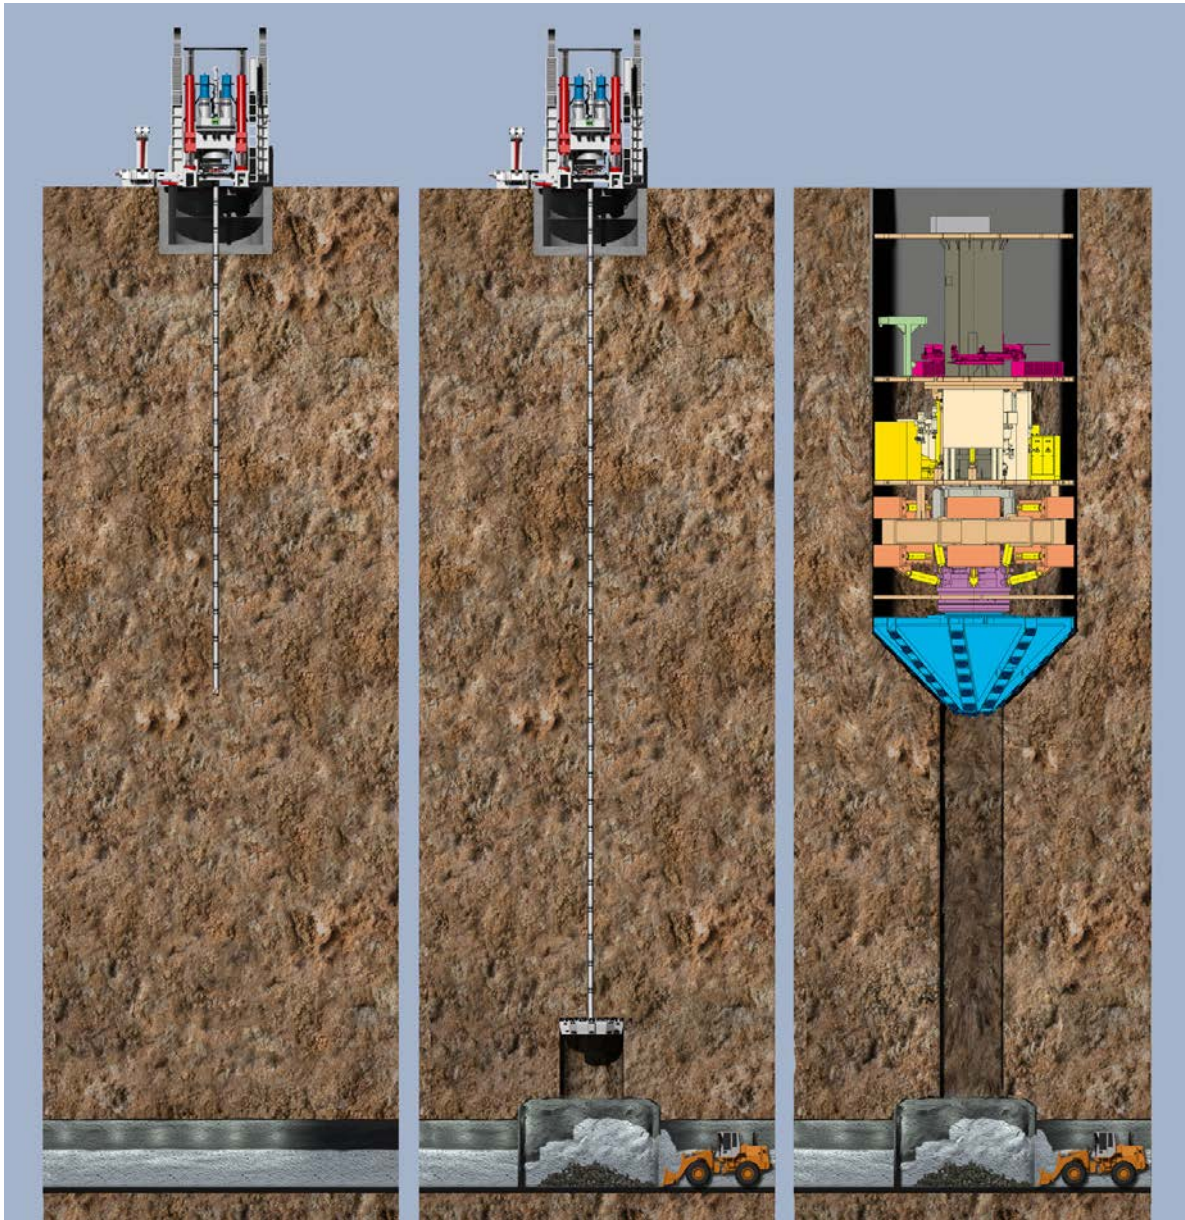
Operating principle of the shaft enlargement machine for shaft boring using the pilot borehole
